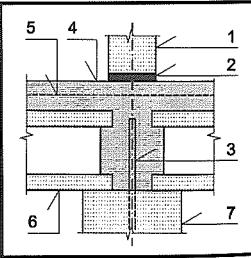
Hollow Core Slabs Beam/Wall Connection
